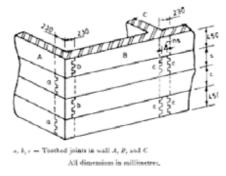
Alternated Toothed Joints In Walls At Corner and T-Junction
